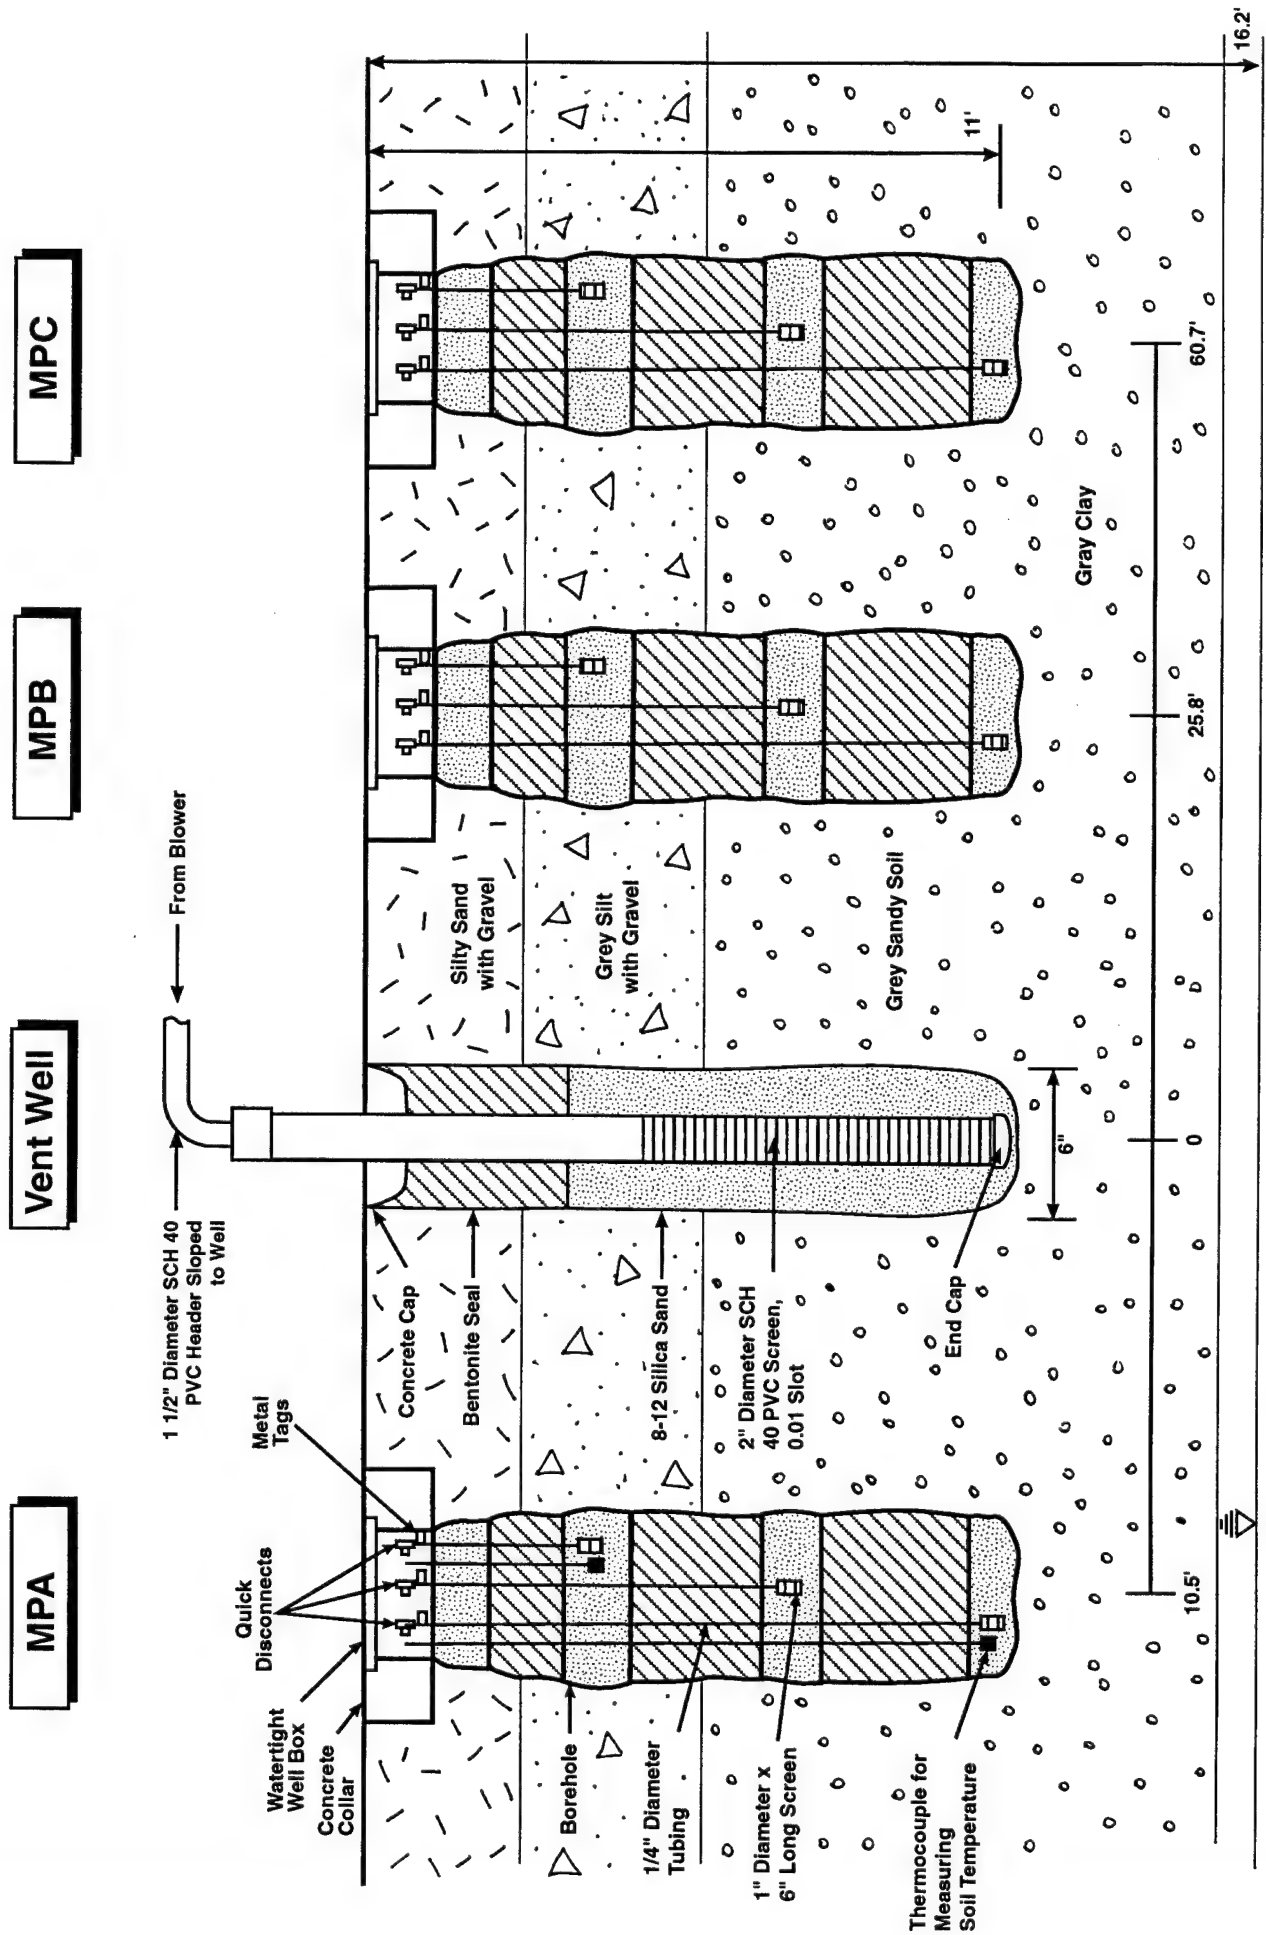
Cross Section of Vent Well and Monitoring Points at the Saddle Tank Farm Site Showing Site Lithology and Construction Detail (not to scale)
